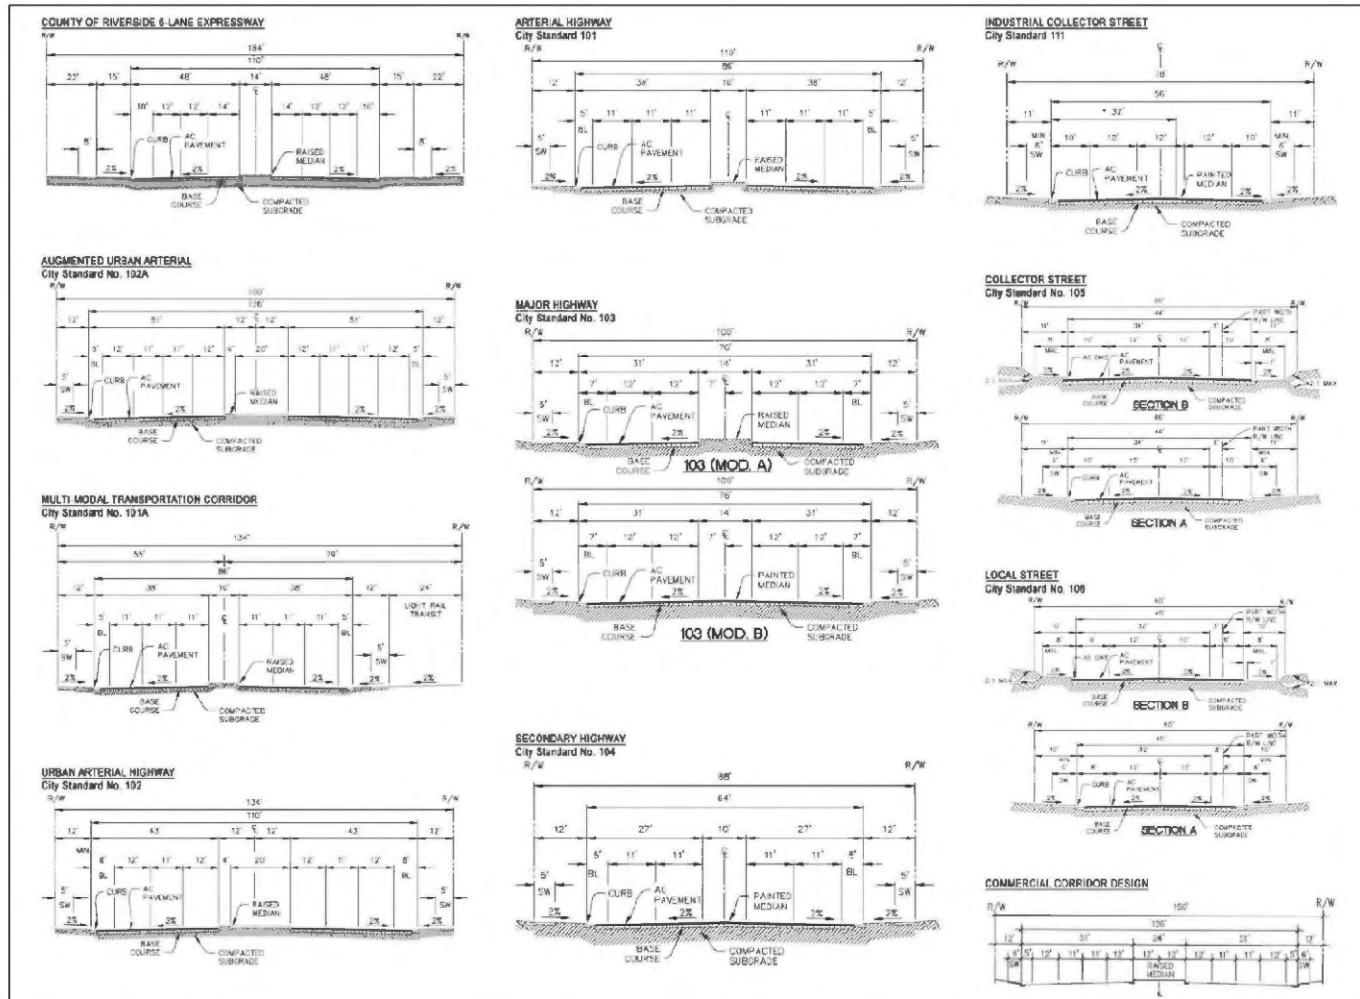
CITY OF MURRIETA GENERAL PLAN CIRCULATION ELEMENT
